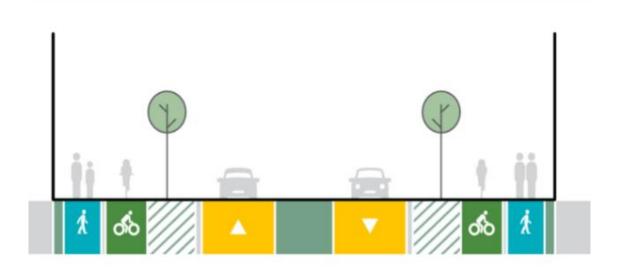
NOR 5 – Indicative cross section of the Sandspit Road project
